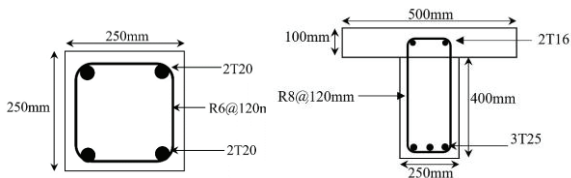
Typical Reinforcement Details of RC Beams and Columns
